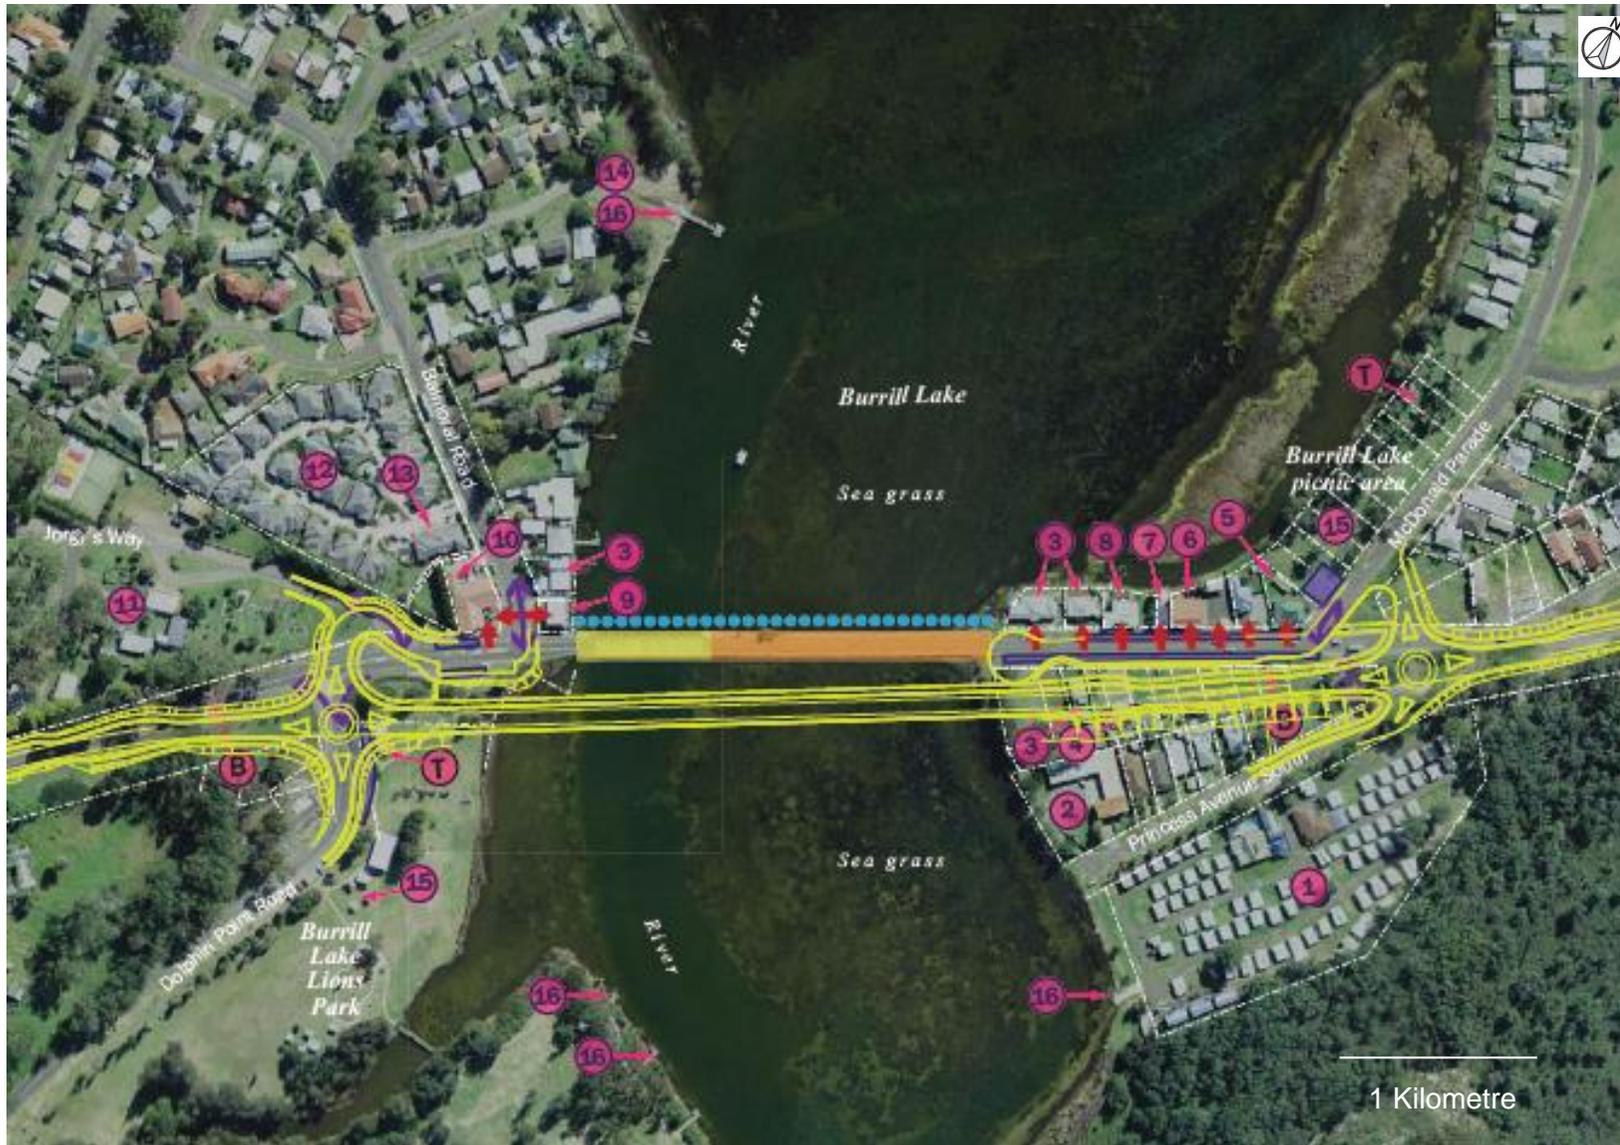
Retail district either side of the existing crossing (Source: *Urban design and visual assessment, provided in full, Appendix H*).
